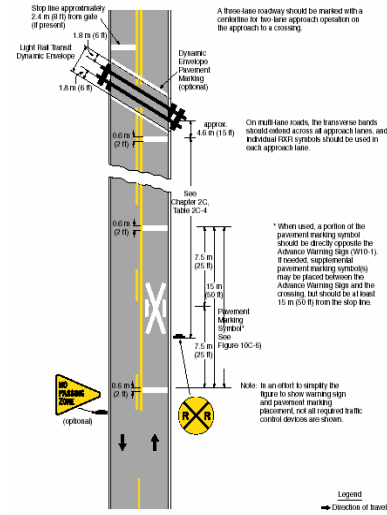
C-6. Examples of Highway-Light Rail Transit Grade Crossing Pavement Markings
